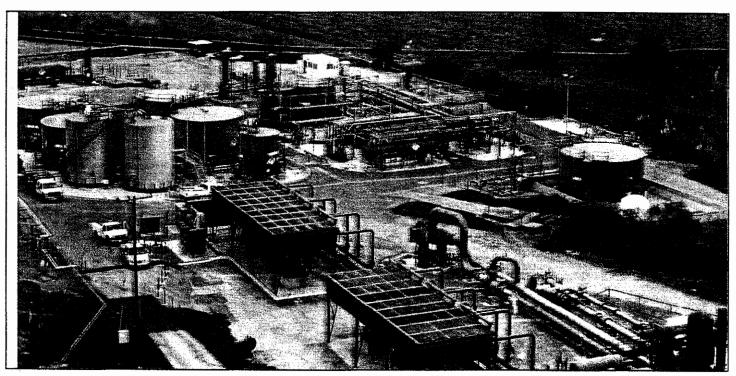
Photo taken from adjacent hillside facing west. Photo views eastern side of Project within fully developed facility.
